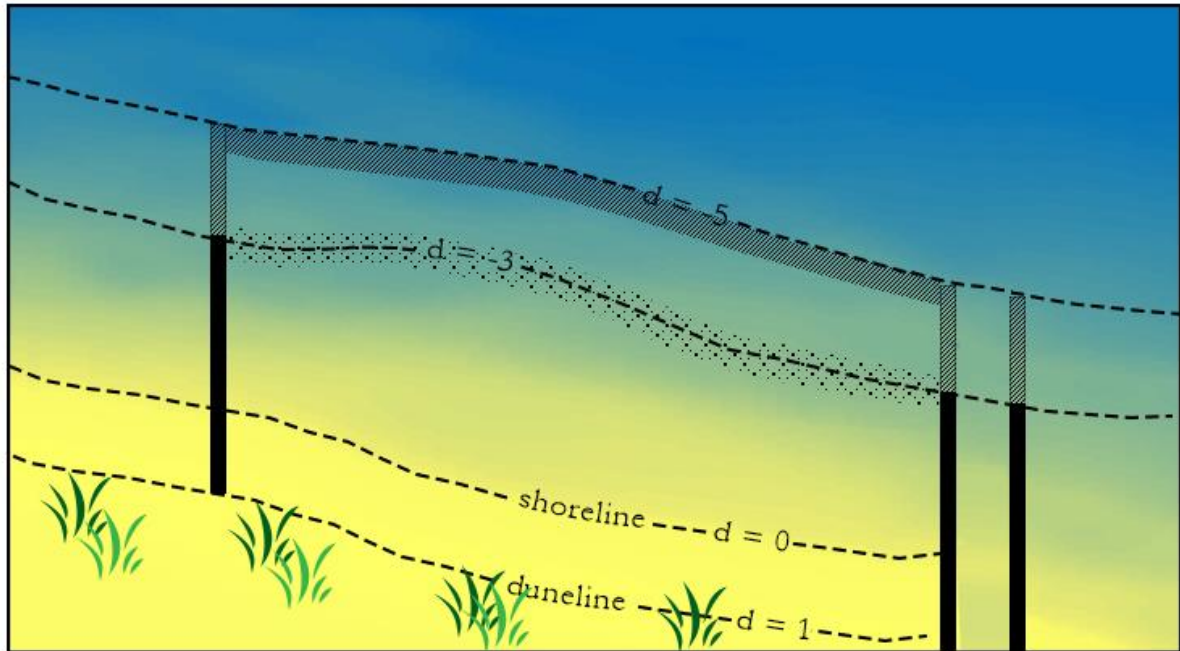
Plan view of combined alternatives coral reef and breakwater
